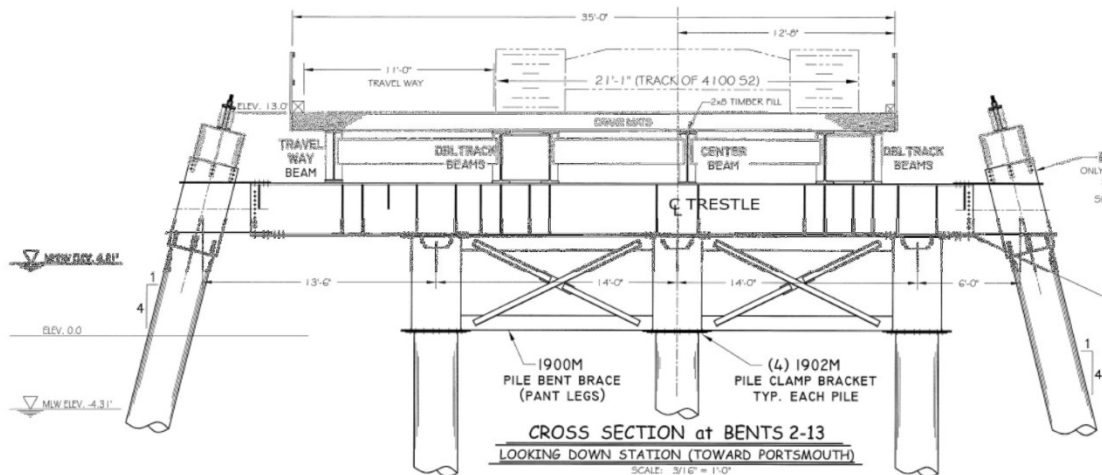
Typical SML Temporary Crane Trestle Bent Elevation
